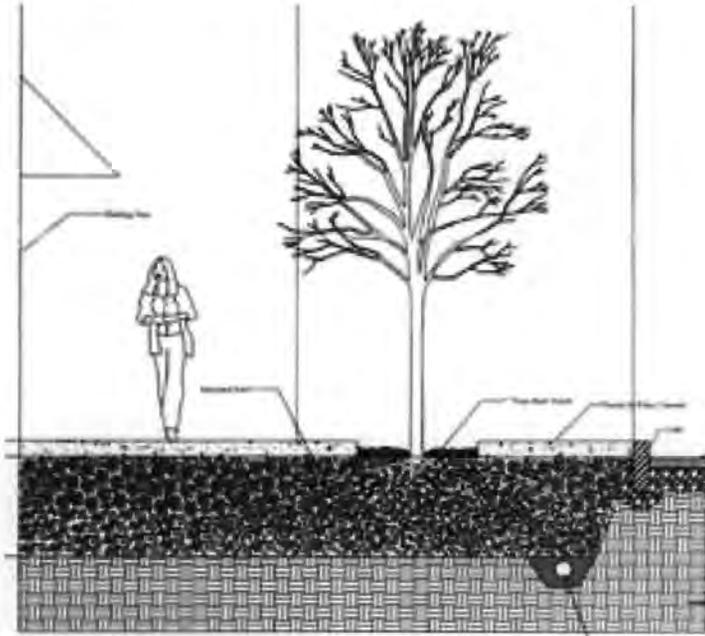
Structural soils provide void space for root growth and load-bearing for sidewalk
